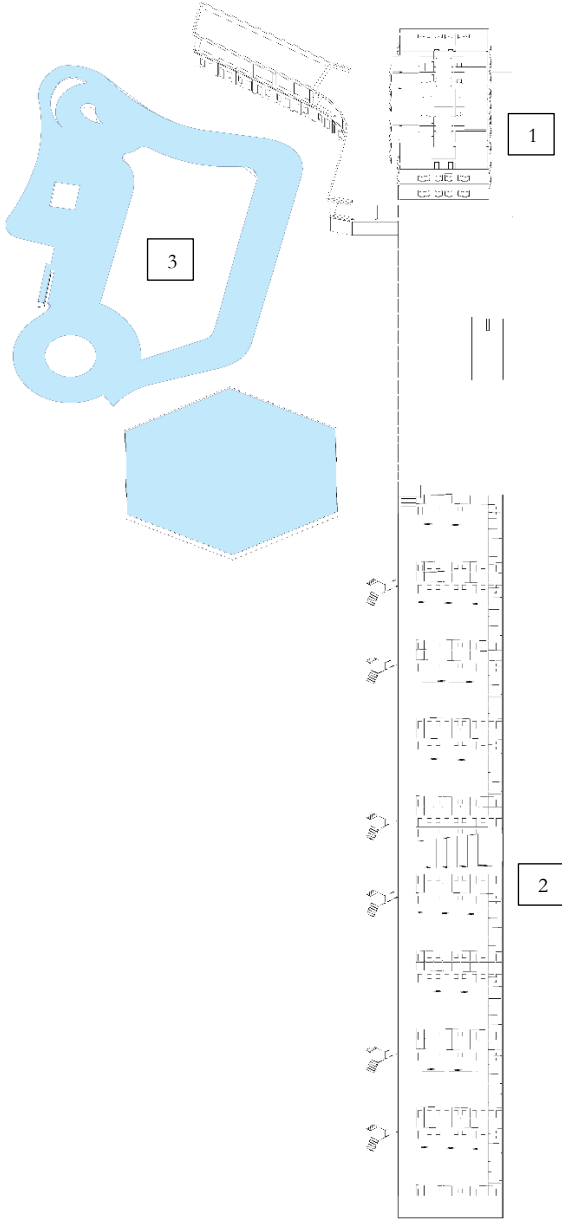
Lido di Mortelle plan oblique. Drawing by author, April 14, 2026.
